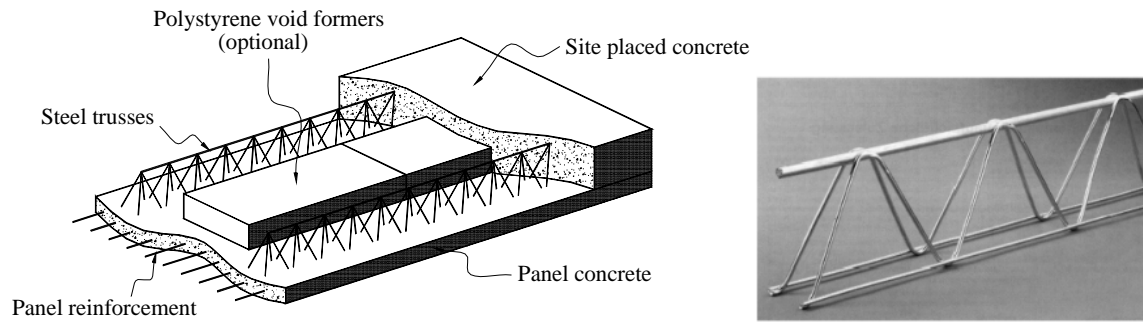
Characteristics of the lattice girder system, a composite permanent formwork, and a lattice girder truss.
